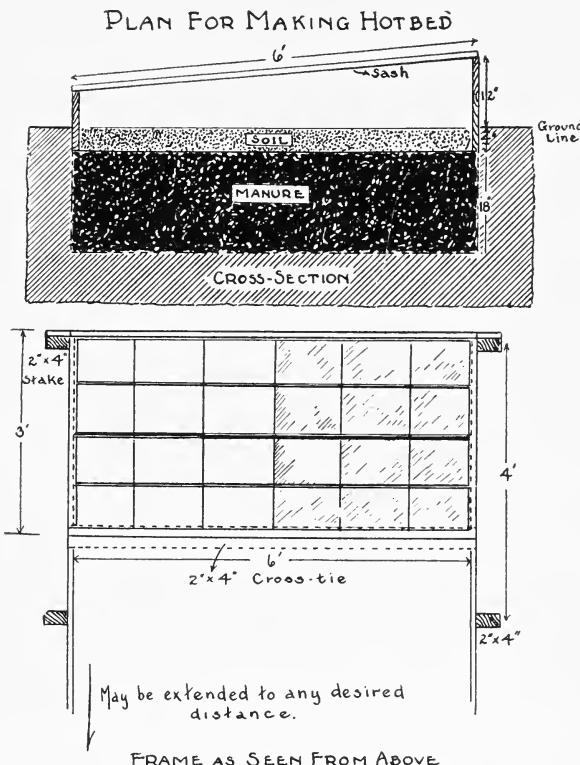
Above, cross section of hotbed showing method of construction and filling. Below, top view of coldframe or hotbed, with dimensions and method of construction. (Exp. Sta. Cir. 262.)
